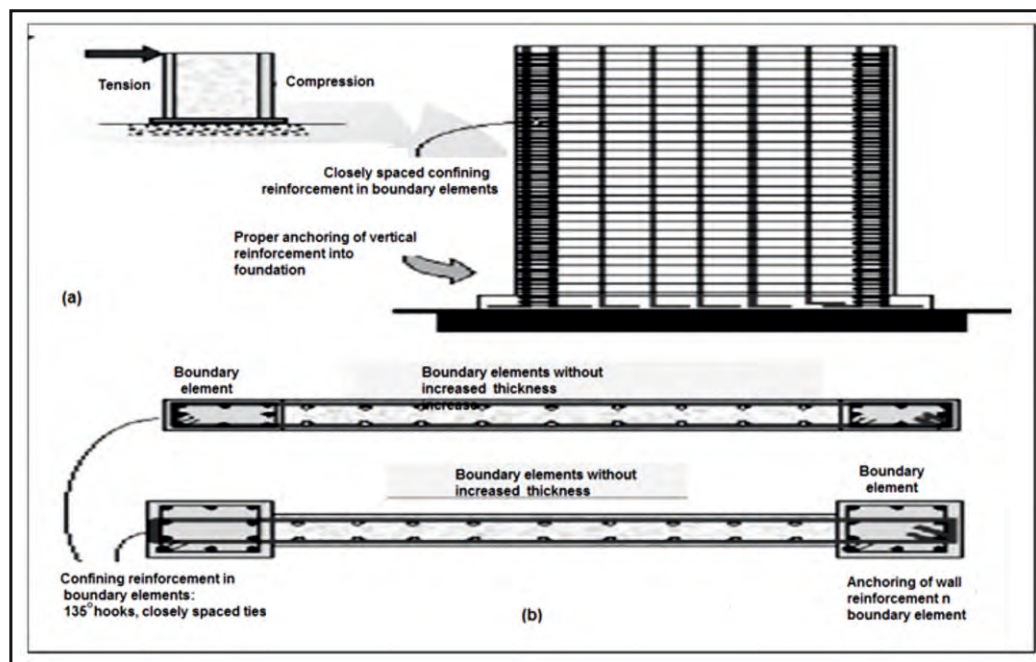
A typical ductile detailing of reinforcements in shear wall
